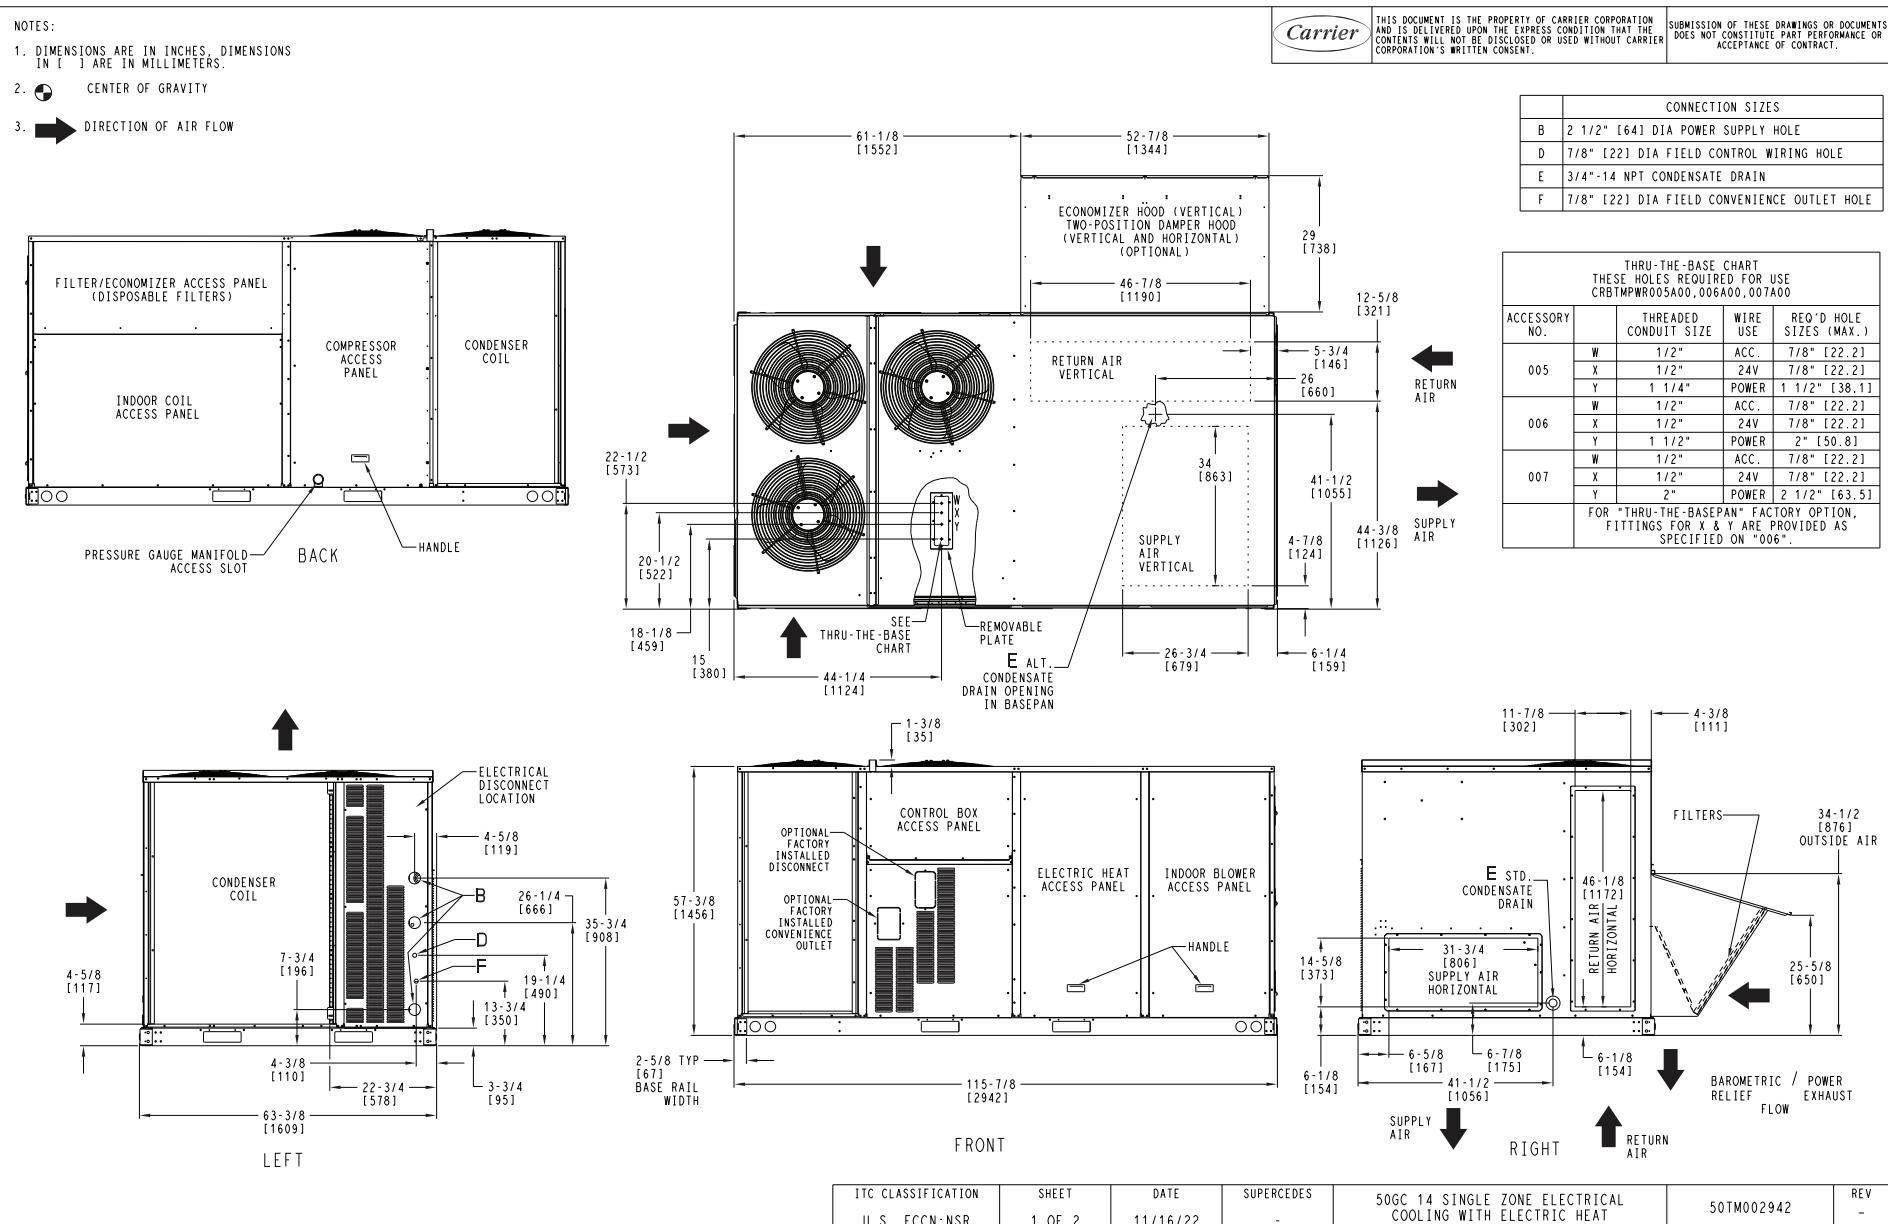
50GC-\*14 Unit Dimensional Drawing
